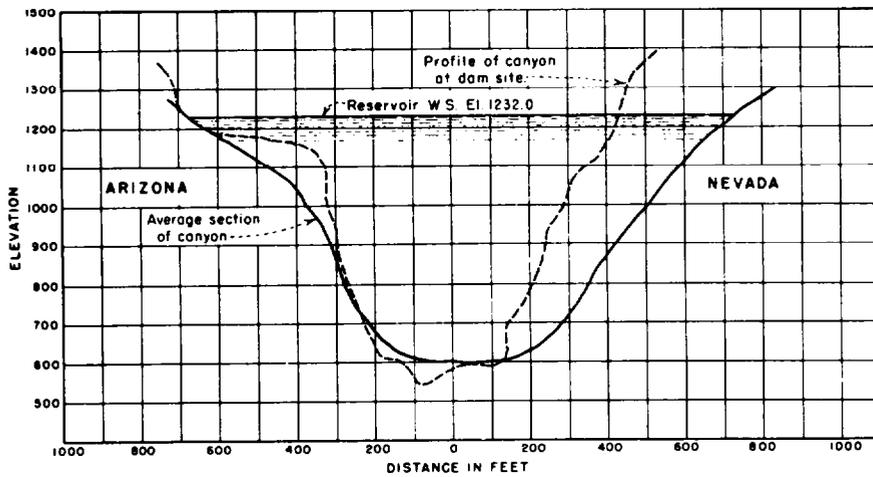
Hoover Dam studies—cross section of canyon above dam.—DS2-1(284)
